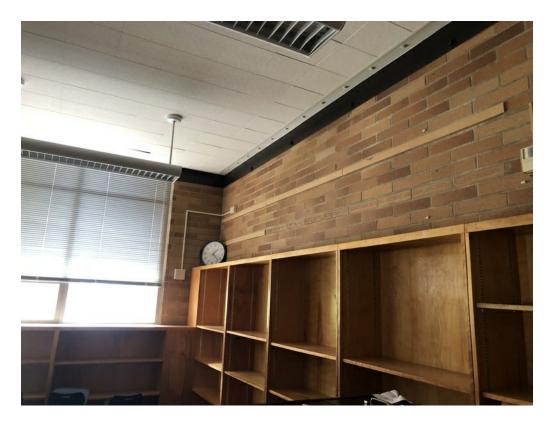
Connection of Roof Diaphragm to Masonry Wall (1996 Remodel)
